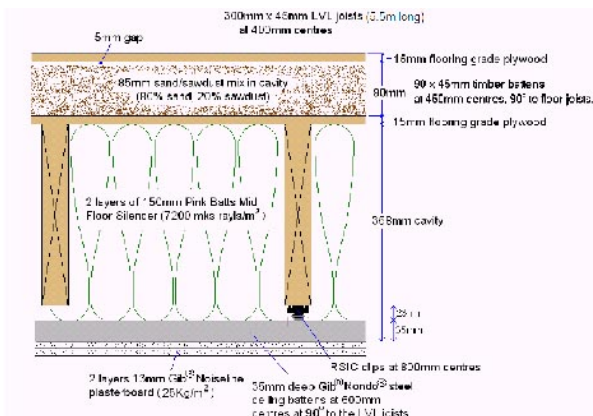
A design for an LTF floor-ceiling system which is subjectively equivalent to a 150mm concrete slab with suspended plasterboard ceiling for insulating against heavy impacts.
